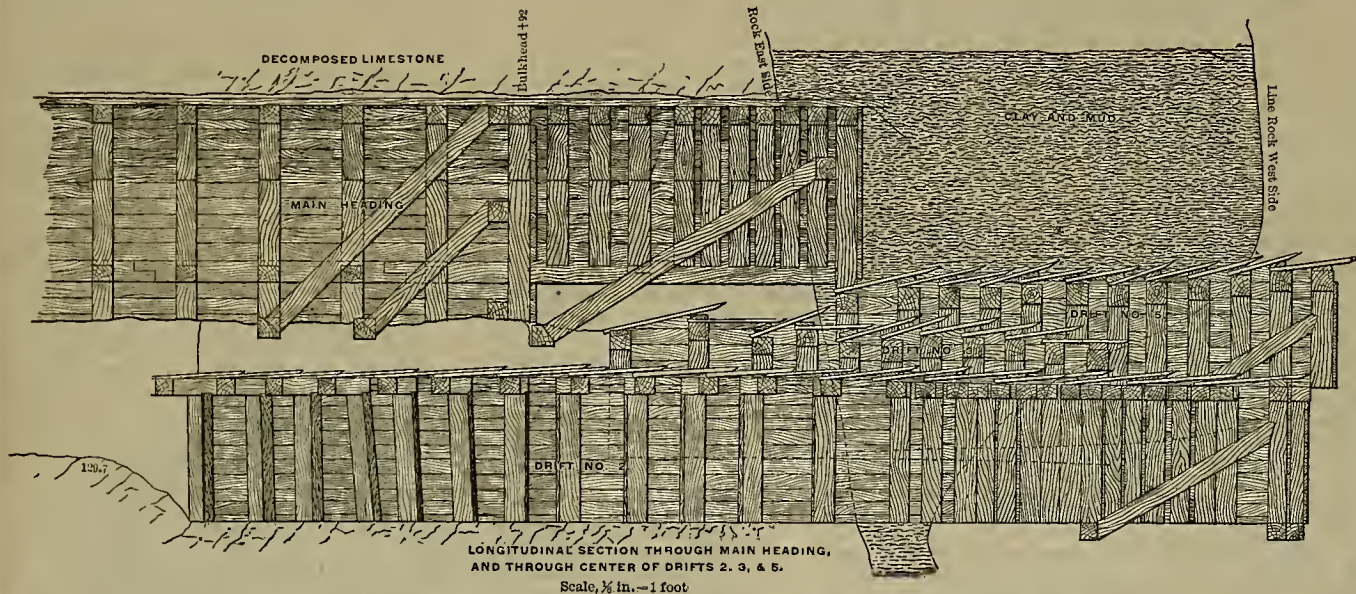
DRIFTS AND TIMBERING IN BAD GROUND. SHAFT NO. 13, SOUTH HEADING.
